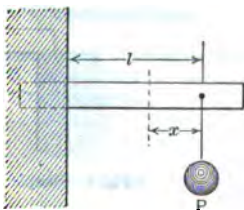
Cantilever Beam. Concentrated Load near Free End
